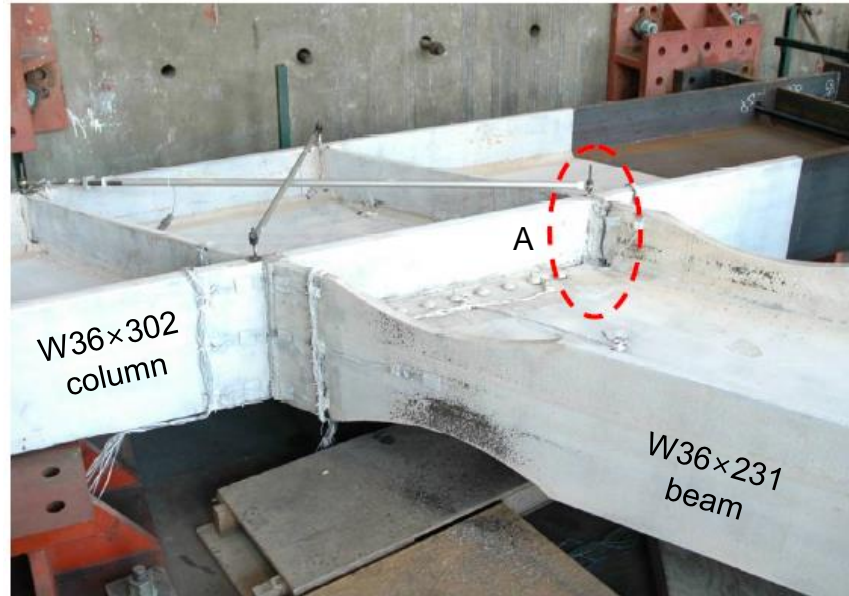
Detail of LAX Connection Specimens (Kim et. al. 2010)
